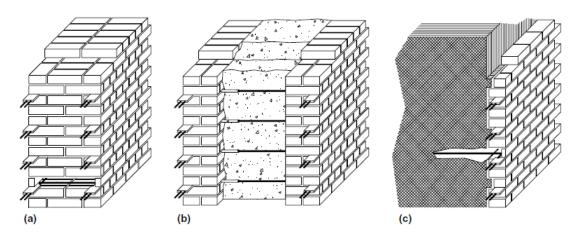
Example of application of the technique on different types of brick masonry walls: (a) solid bearing wall; (b) multi-leaf wall; (c) multi-leaf wall with external veneer wythe
